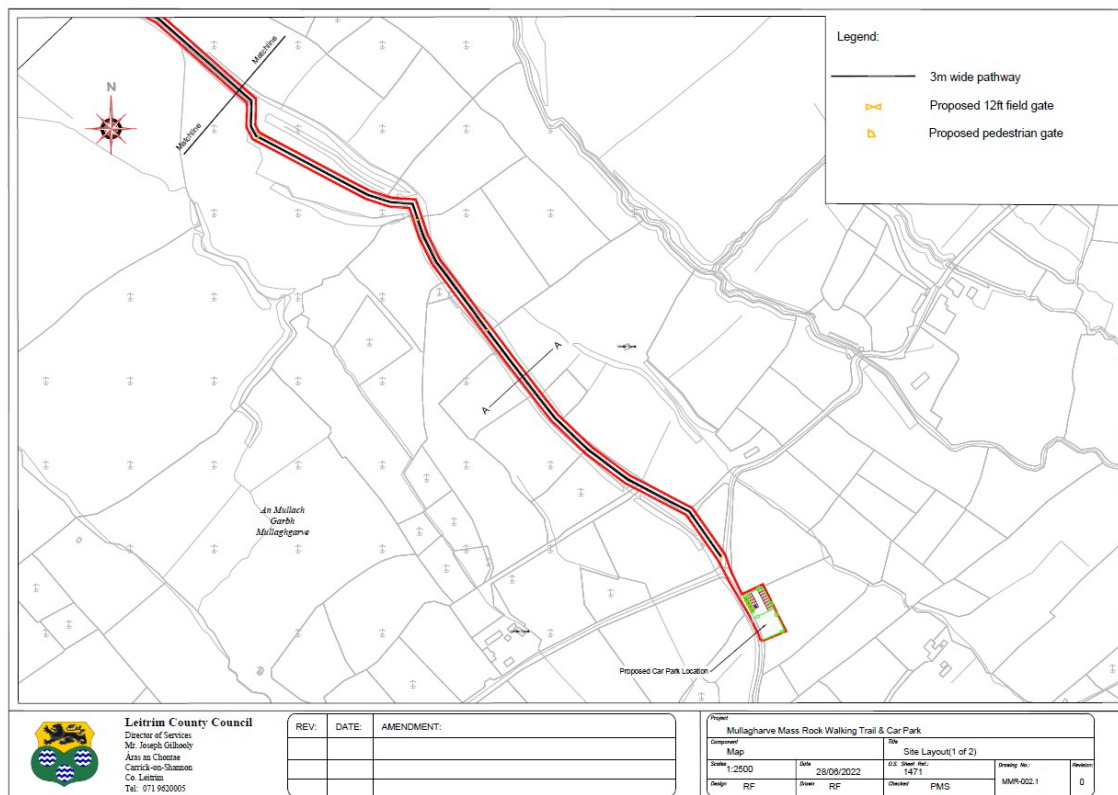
Detailed development plan of the proposed carpark and southern end of the trail.
